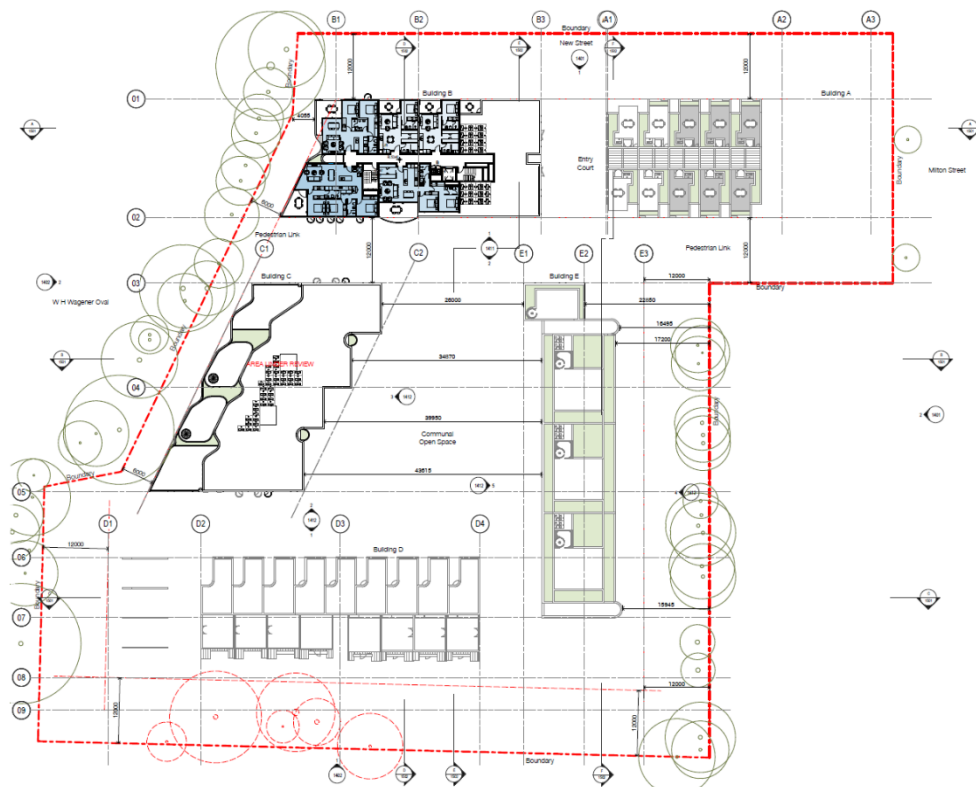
Proposed Overall Level 5 Plan. (Source: SJB Architects)
